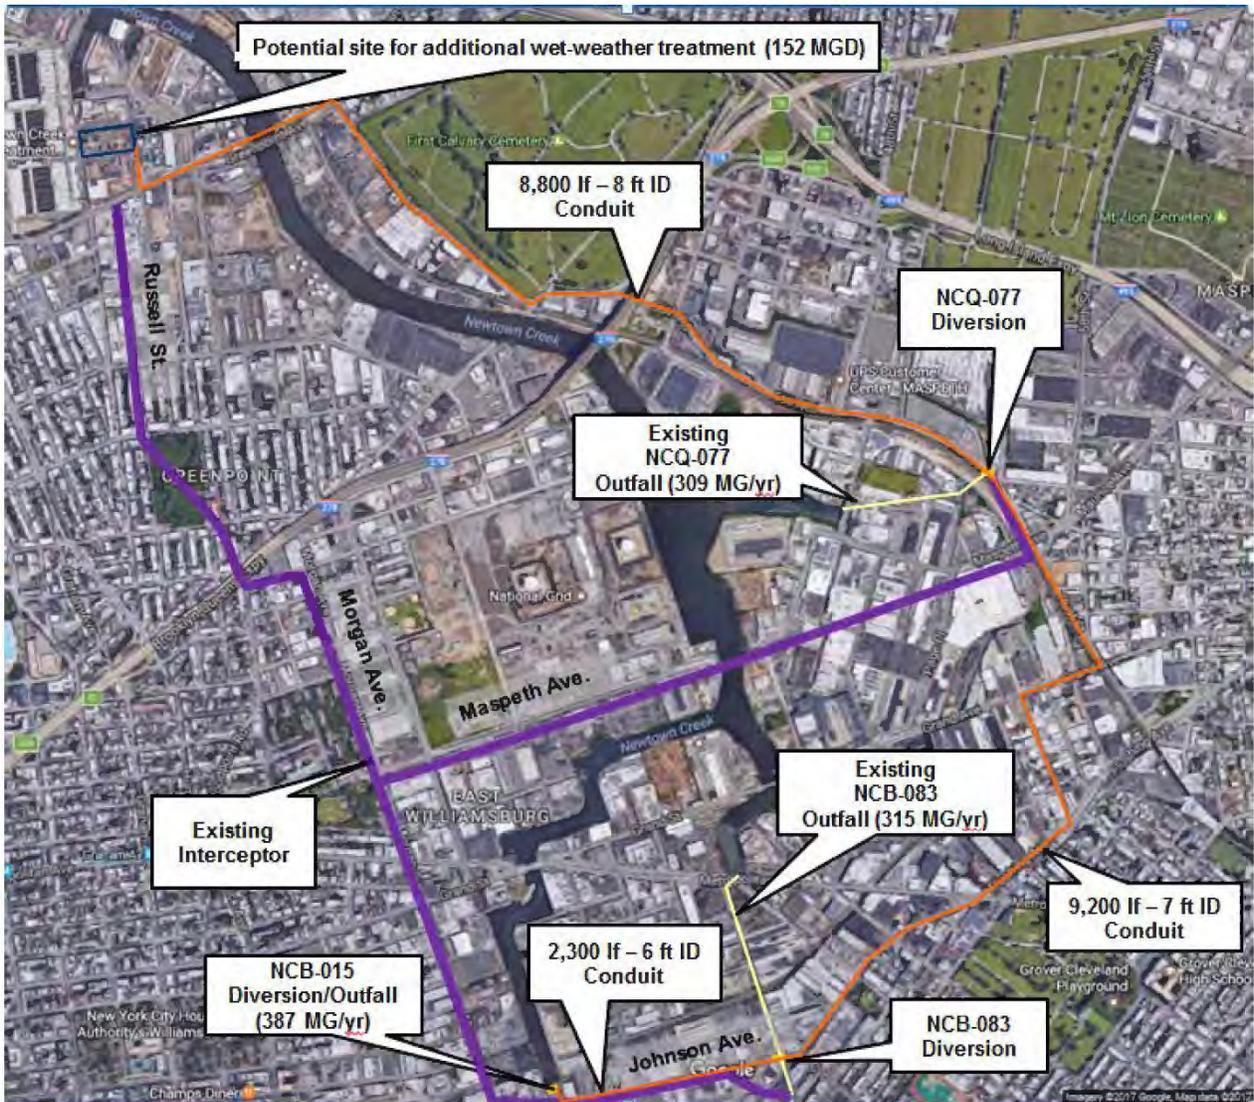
Layout of Alternative RTB-1 – Retention Treatment Basin with Consolidation Conduit for Outfalls NC-015, NC-083 and NC-077
